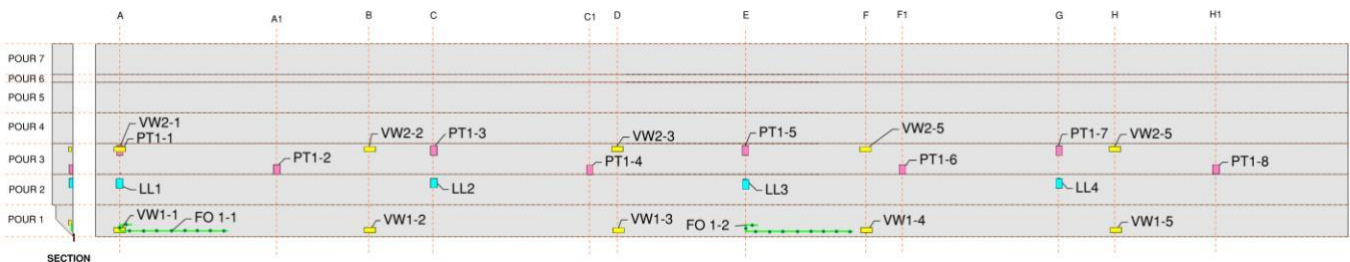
Rolled out elevation view of all the instrumentation cast into the wall.
